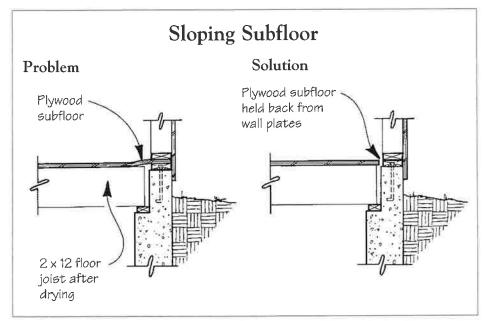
Subflooring that is installed underneath the exterior wall framing (left) will cause a slope as the floor joists shrink. Where floor joists bear on a foundation ledge, the subflooring should stop short of the exterior wall (right). This allows the subfloor to move with the joists as they shrink.
